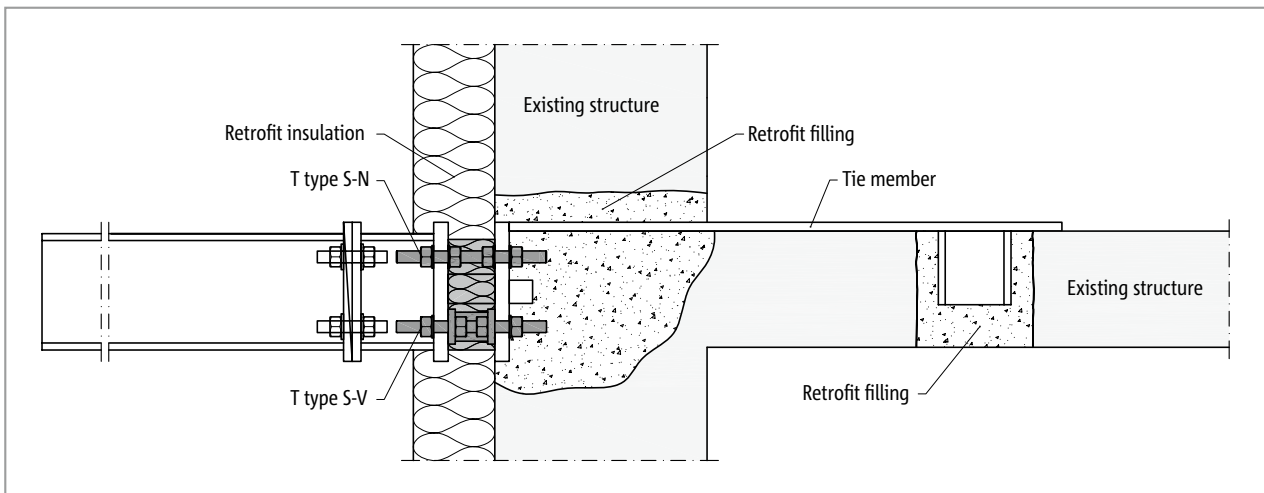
Schöck Isokorb® T type S-N and T type S-V: Retrofitted cantilevered steel balcony with adapter, with support bracket connected to existing reinforced concrete slab
